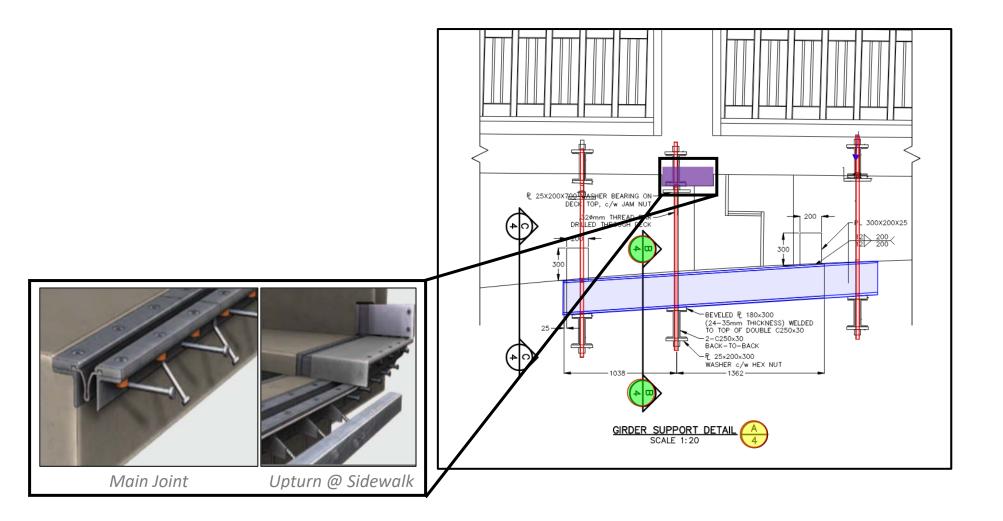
Provides an example of expansion-joint repair by use of a girder support system.
